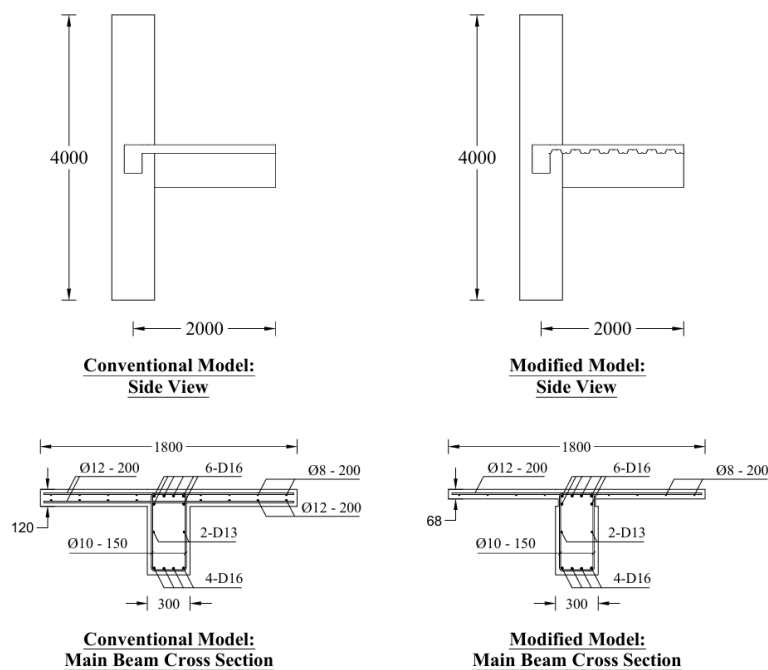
Geometry and Reinforcement Configuration of RC Beam-Column Joint
